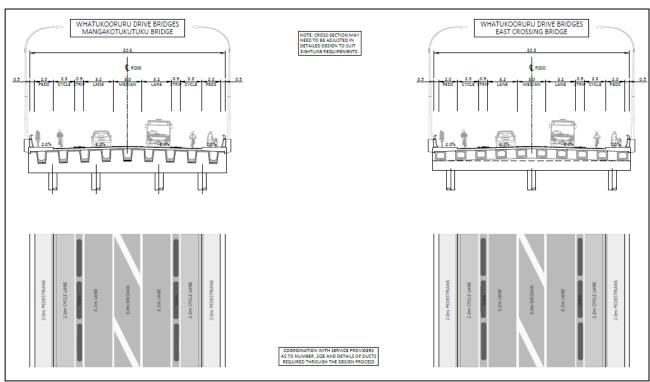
Whatukooruru Drive Typical Bridge Cross Sections
